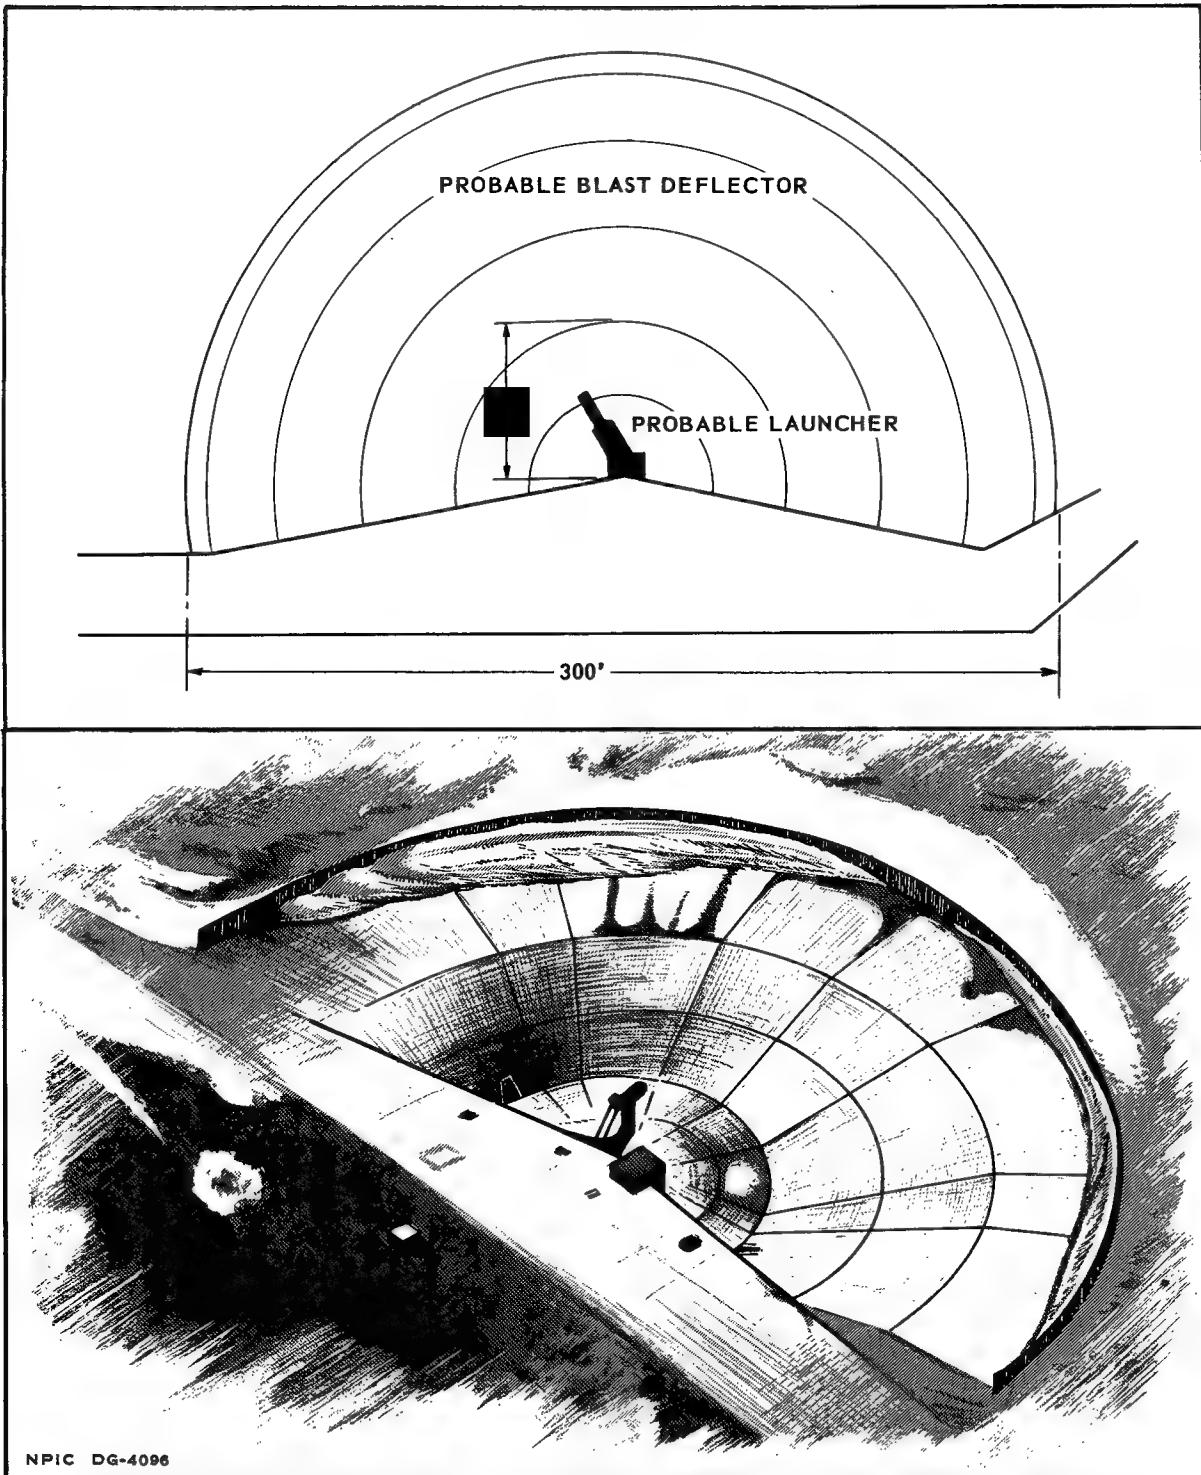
CONCEPT OF PAD B-1. This drawing shows the "amphitheater" shape of the pad.
